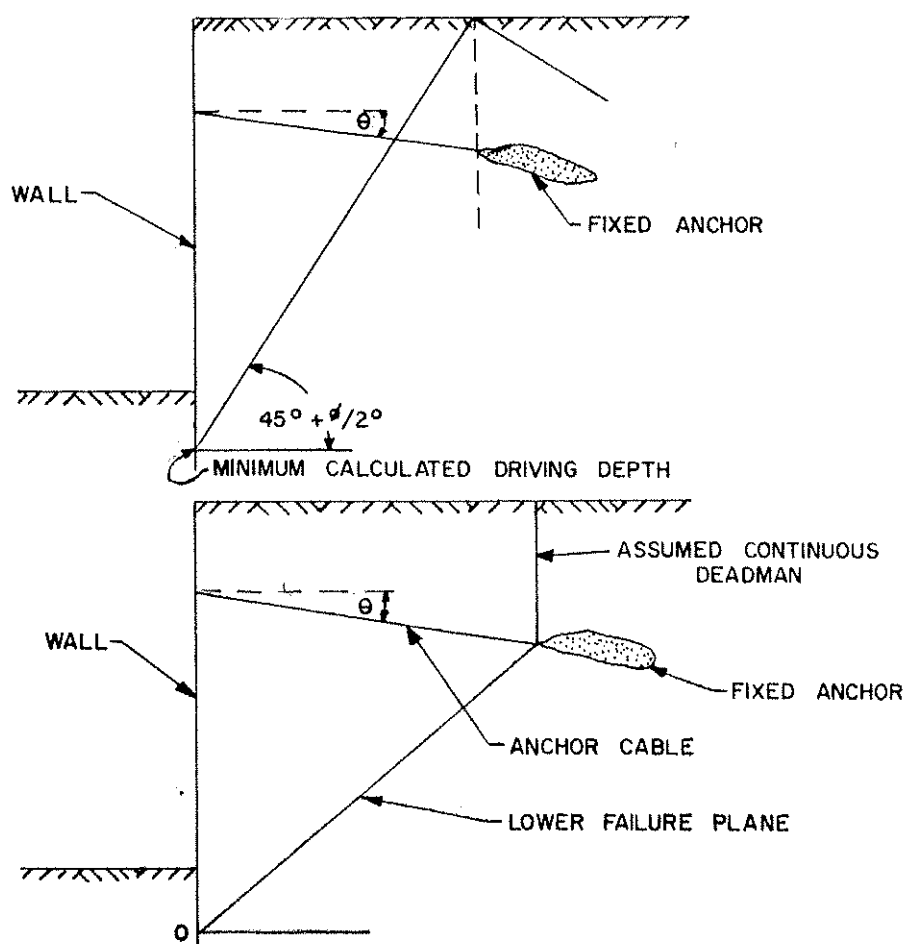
Method of determining anchor length. This method assumes that failure of the wall would take place along a failure plane.
